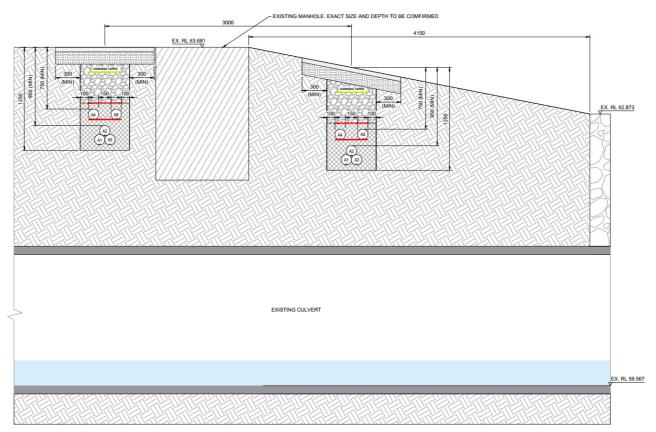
Cross-section of HV transmission lines trench crossing above the culverted Griffeen River (*Source: Drawing no. 20 167-CSE-GEN-ZZ-DR-C-2130, CSEA Consulting Engineers*)
